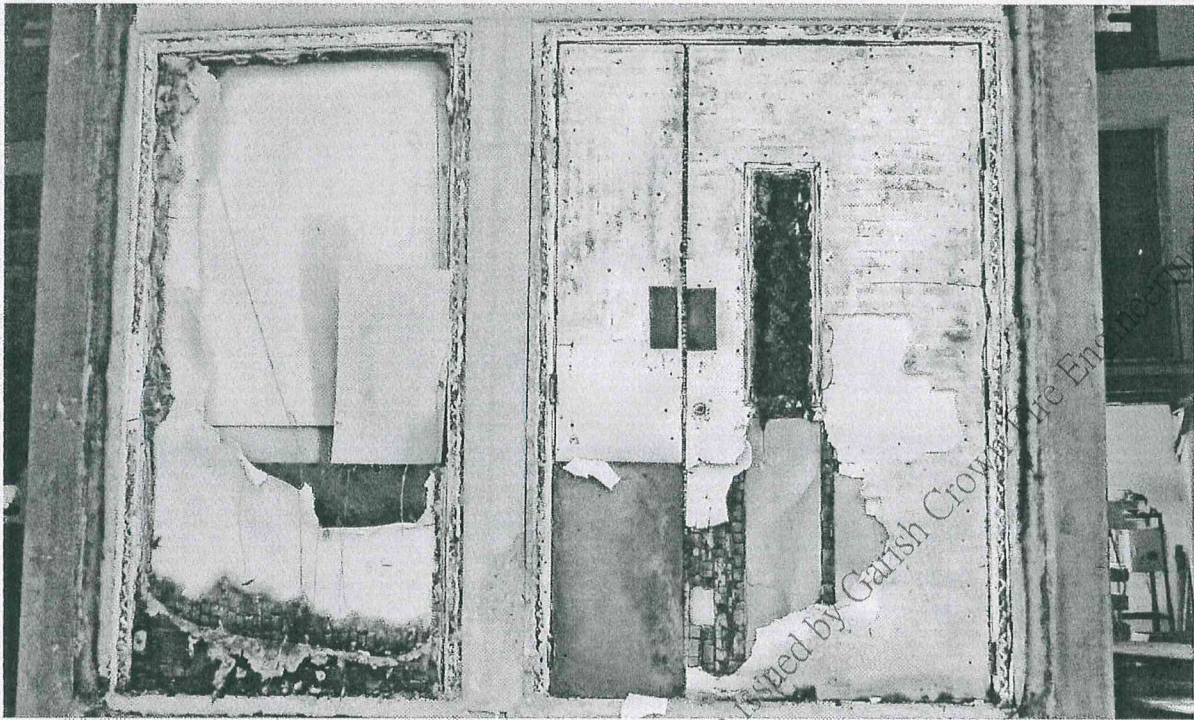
Exposed surface of the specimen after test. (Left: Door B; Right: Door A)
